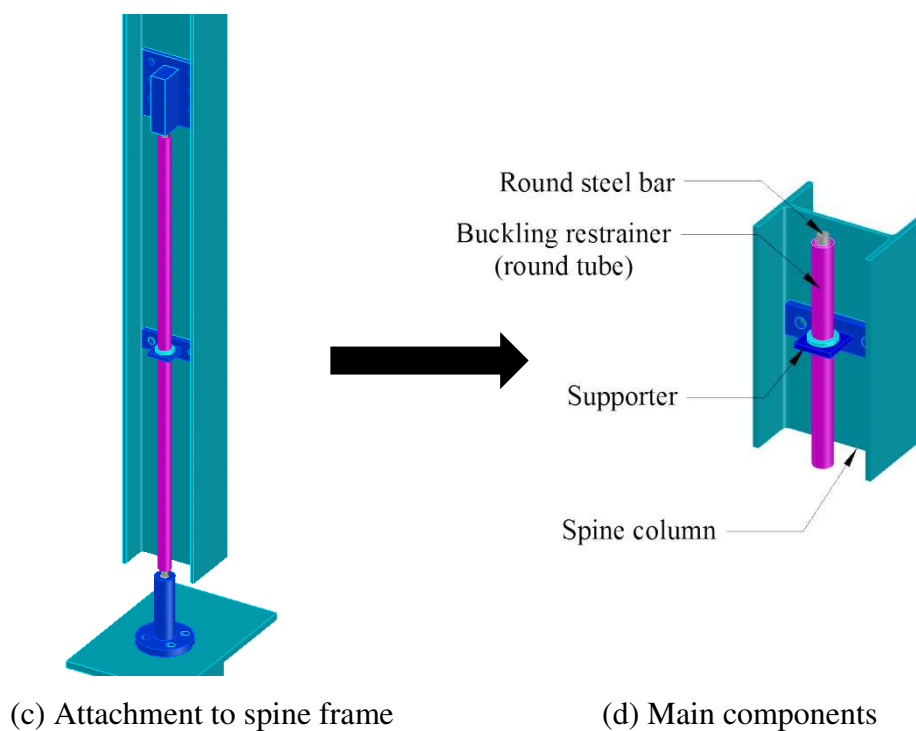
Proposed buckling-restrained steel bar dampers (cont.)
